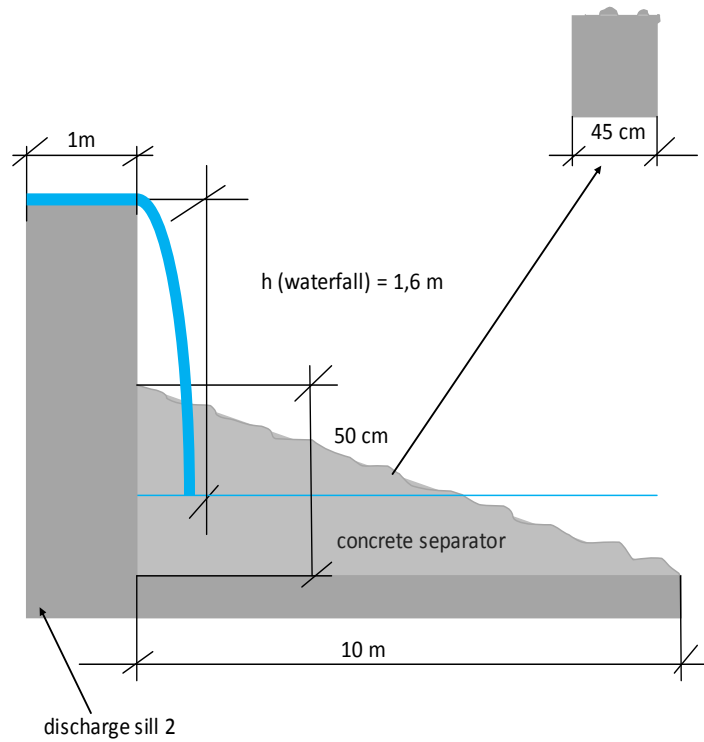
A longitudinal cross-section of the existing concrete separator - indicative scheme.
